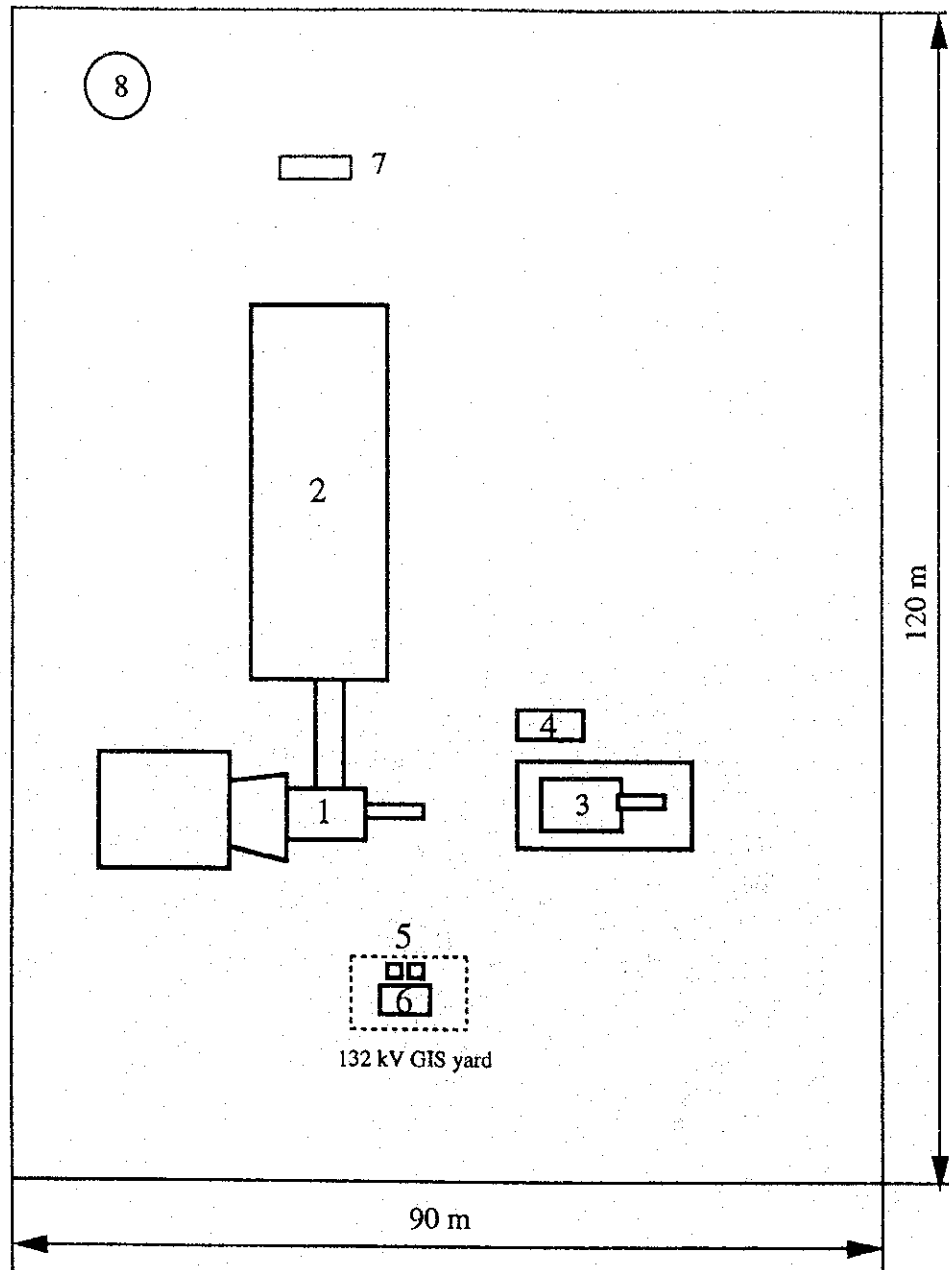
Proposed Location of Power Plant for the Steel Complex
